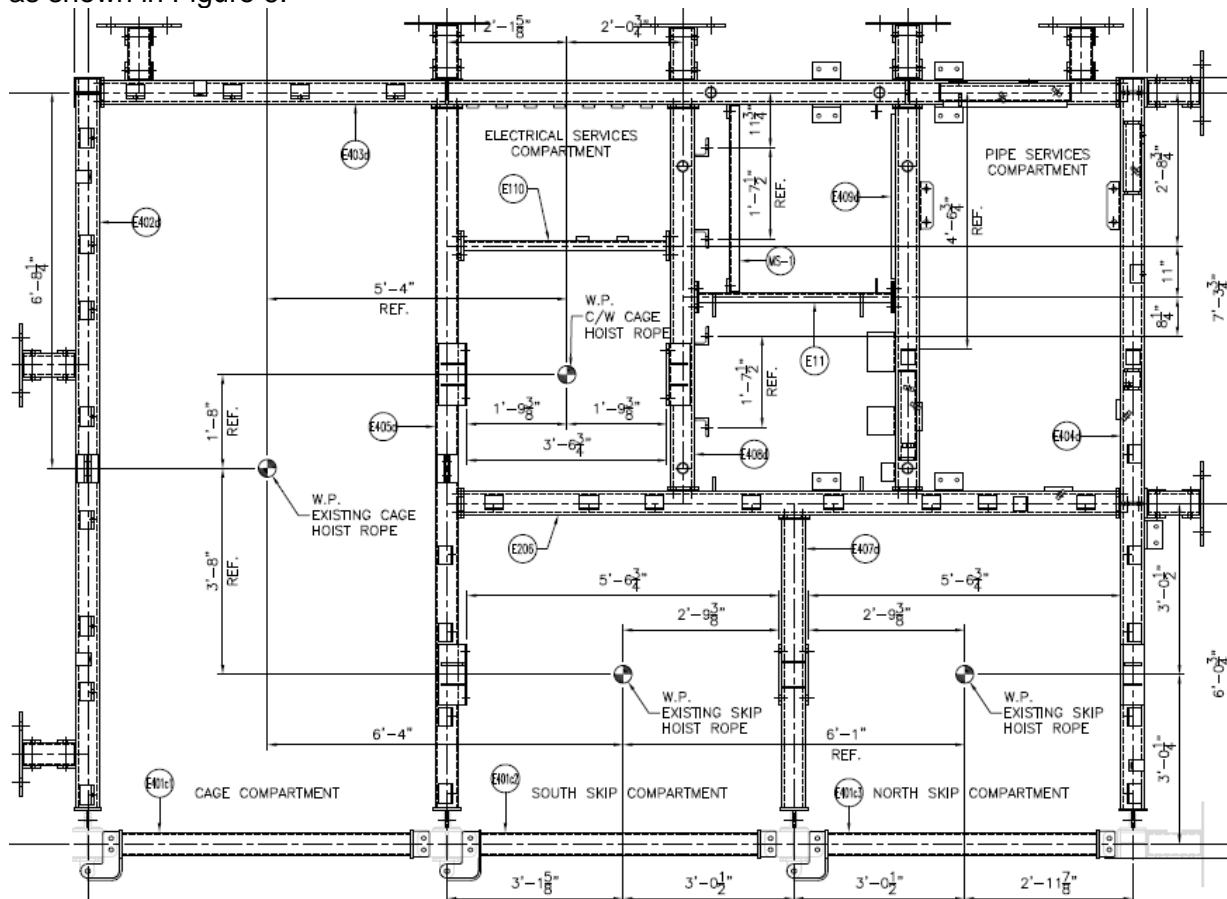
Anchor blocking arrangement near the 4850 level. Excerpt from UGI-H4-402
